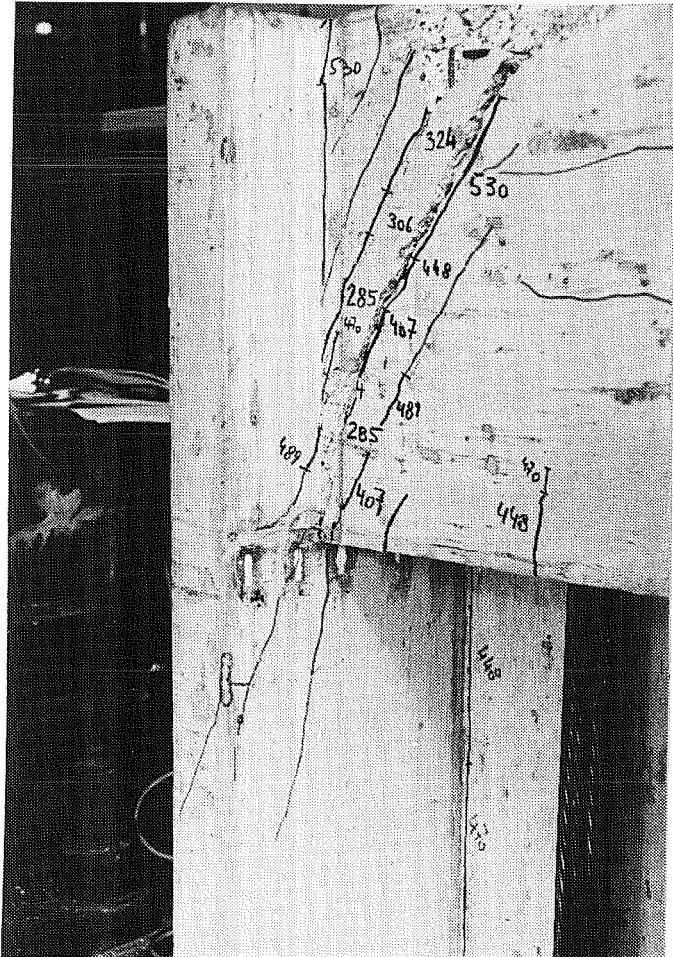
Flange Bursting Cracks Ahead of Diaphragm (Specimen Dia3)
